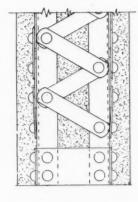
Plan of Column and Elevation of Reinforcement. Structural Reinforcement
